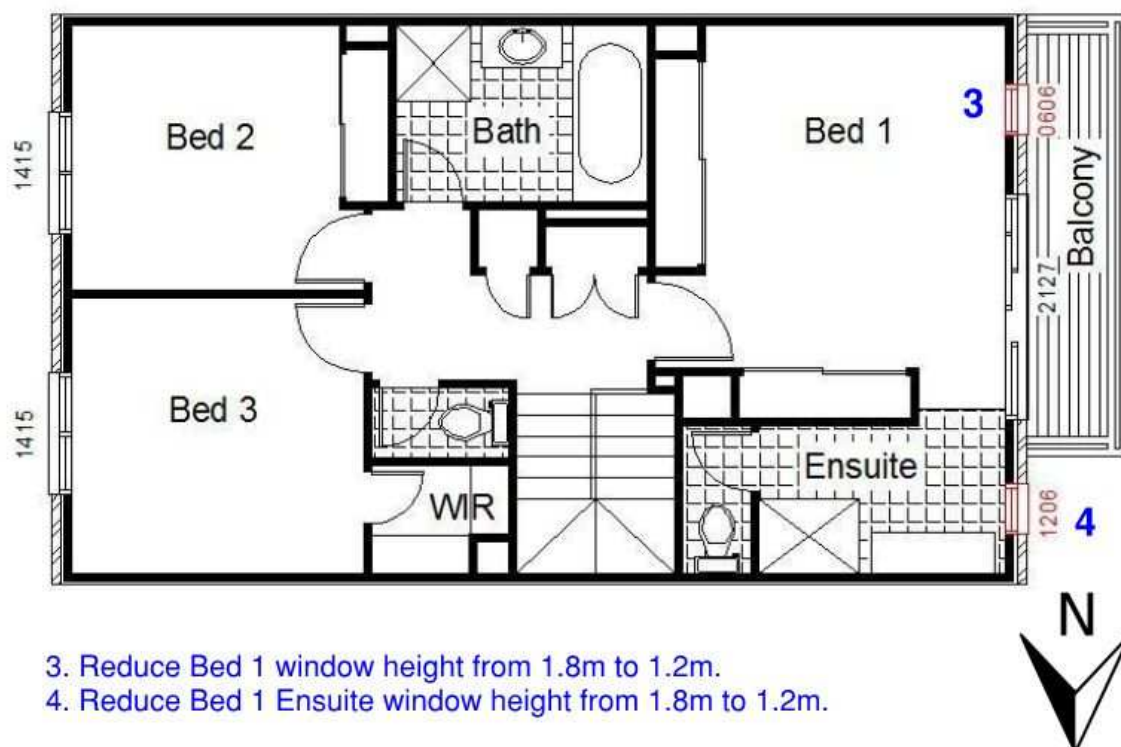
Redesigned first floor plan for Dwelling 16 in Perth
